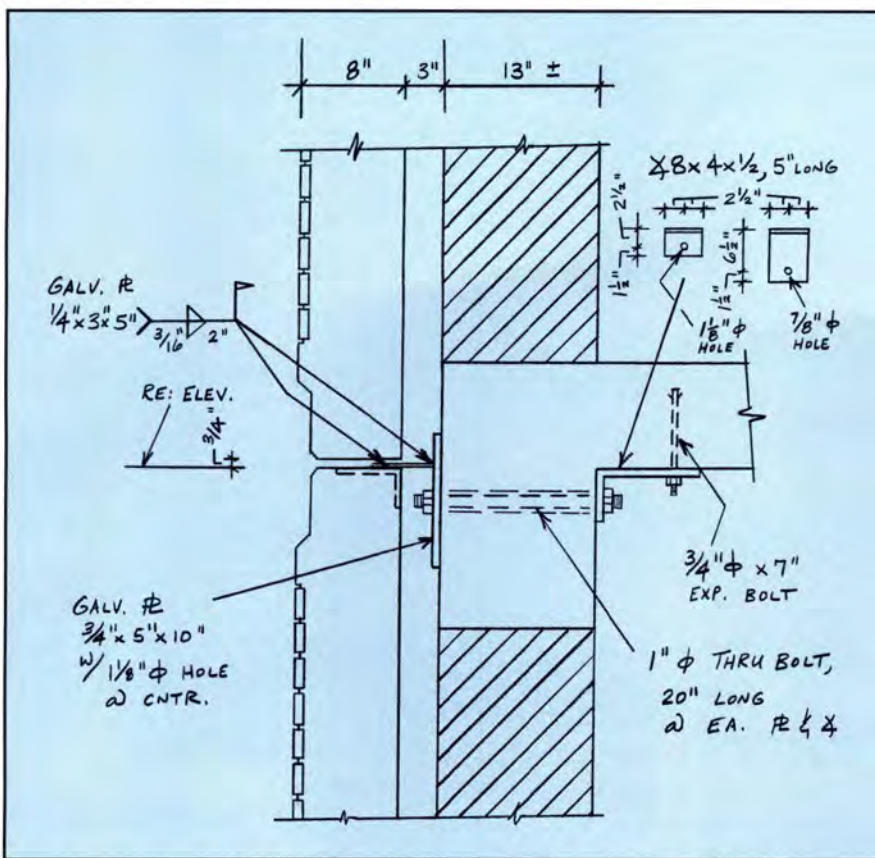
Connection detail showing tie-in between precast panel and structural frame (Gatlin Building) (see Fig. 8).
